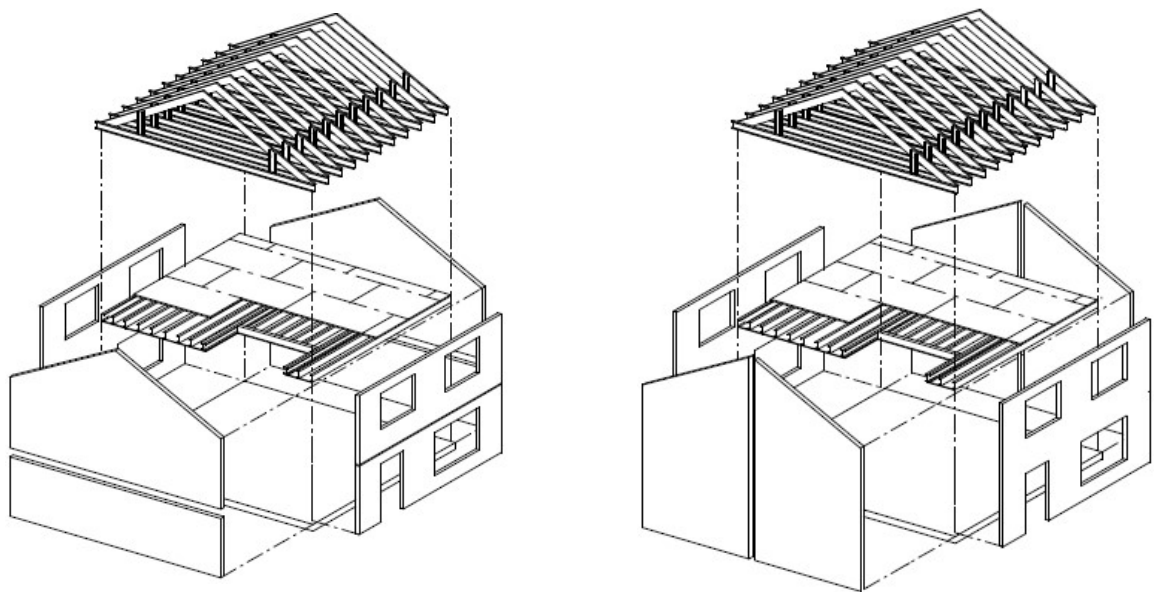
Platform construction (on the left) and balloon frame construction (on the right) [18]
